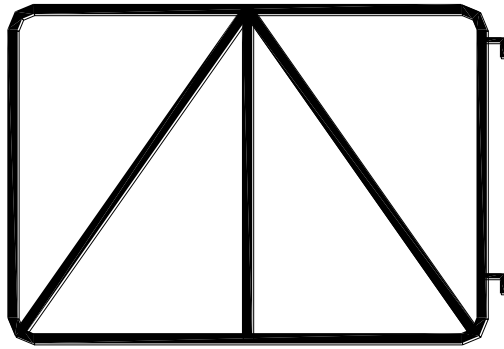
Construction of Steel Gates (Pattern for Timber Gates)
